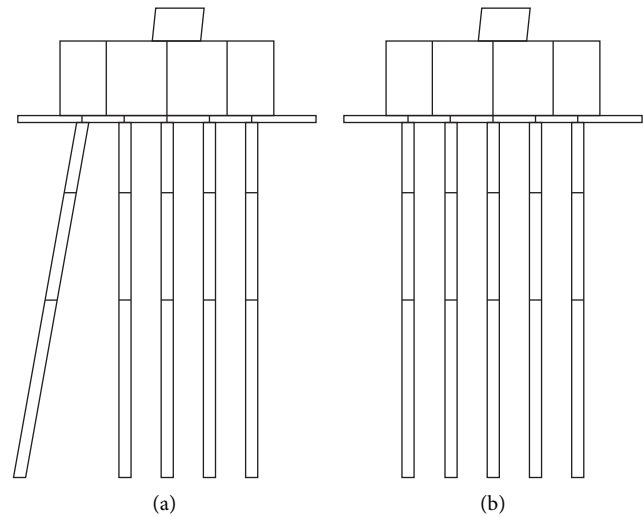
Facade plan of single cap: (a) left elevation; (b) front elevation.
